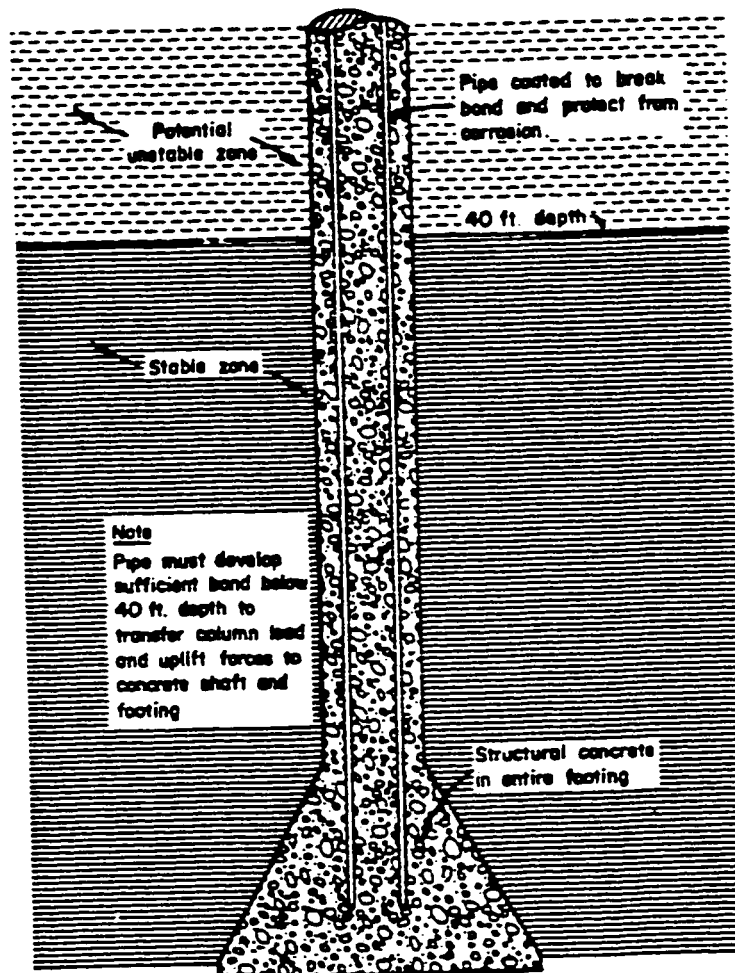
Typical Bell Pier Design (Ref. 7)
